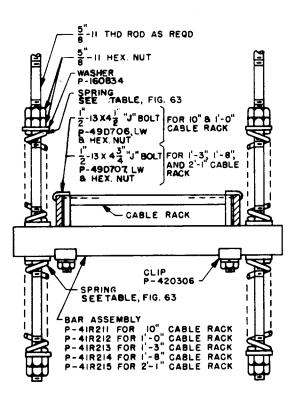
Supplementary and Intermediate Spring Support—Power Cable Racks (A&M Only)
